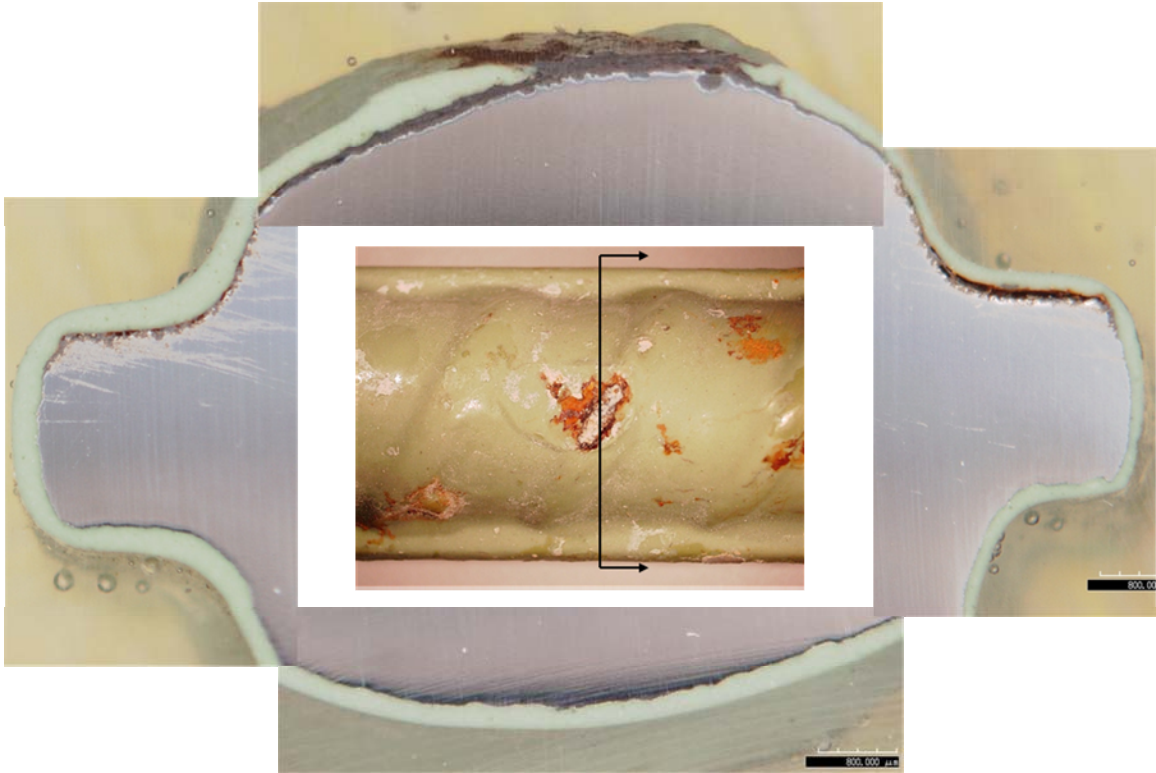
A cross-section through an intentionally damaged area along bar-1 of specimen EP-D-2.
